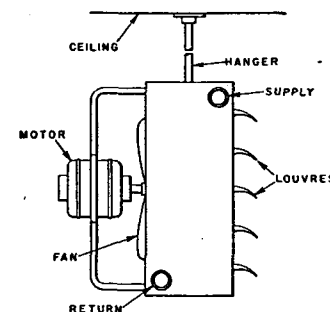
SUSPENDED UNIT HEATER, PROPELLER TYPE FAN
